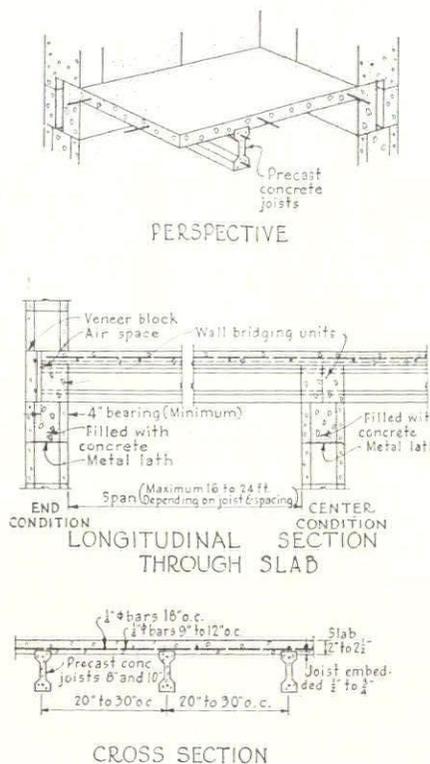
Pre-cast concrete joist residence floor, as shown in detail perspective, longitudinal section, cross section, and perspective of the whole assembly
